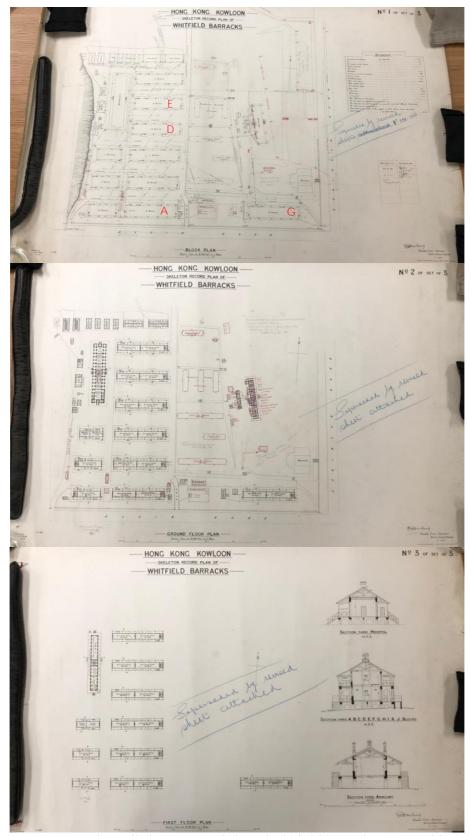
Hong Kong Kowloon, Skeleton Record Plan of Whitfield Barracks, 1906 and further amended in 1909 and 1911, 3 sheets. 66 buildings were built in south half of Whitfield Barracks site, among which 11 were of 2 storeys (Blocks A, B, C, D, E, F, G, H, I, J and Armoury). (Source: The National Archives, WO 78#3744)
